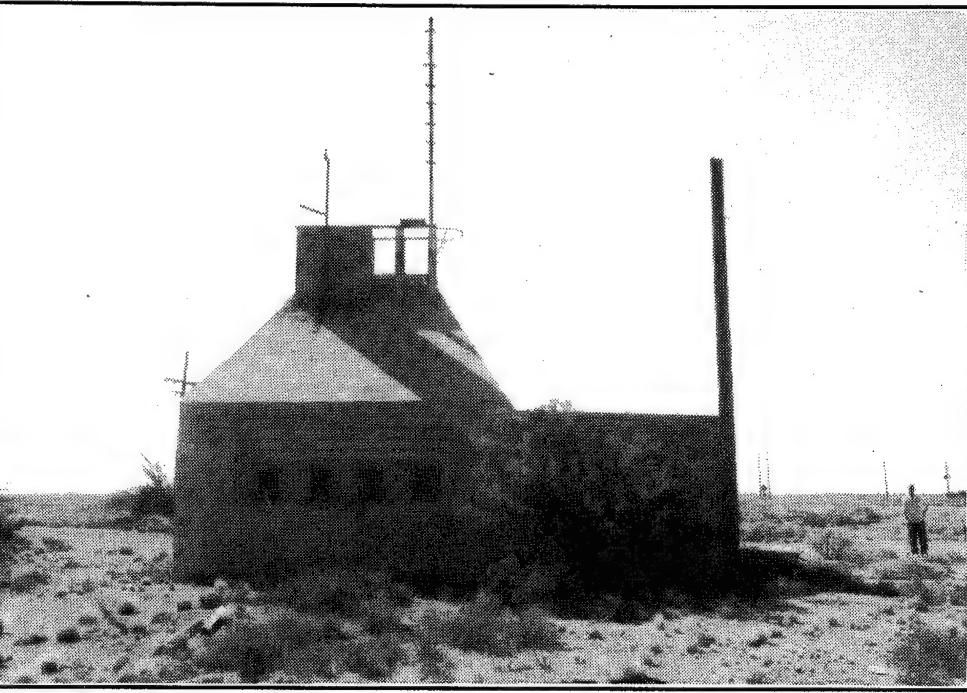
GAPA Blockhouse, north elevation (Allred/Space Center 1994).
